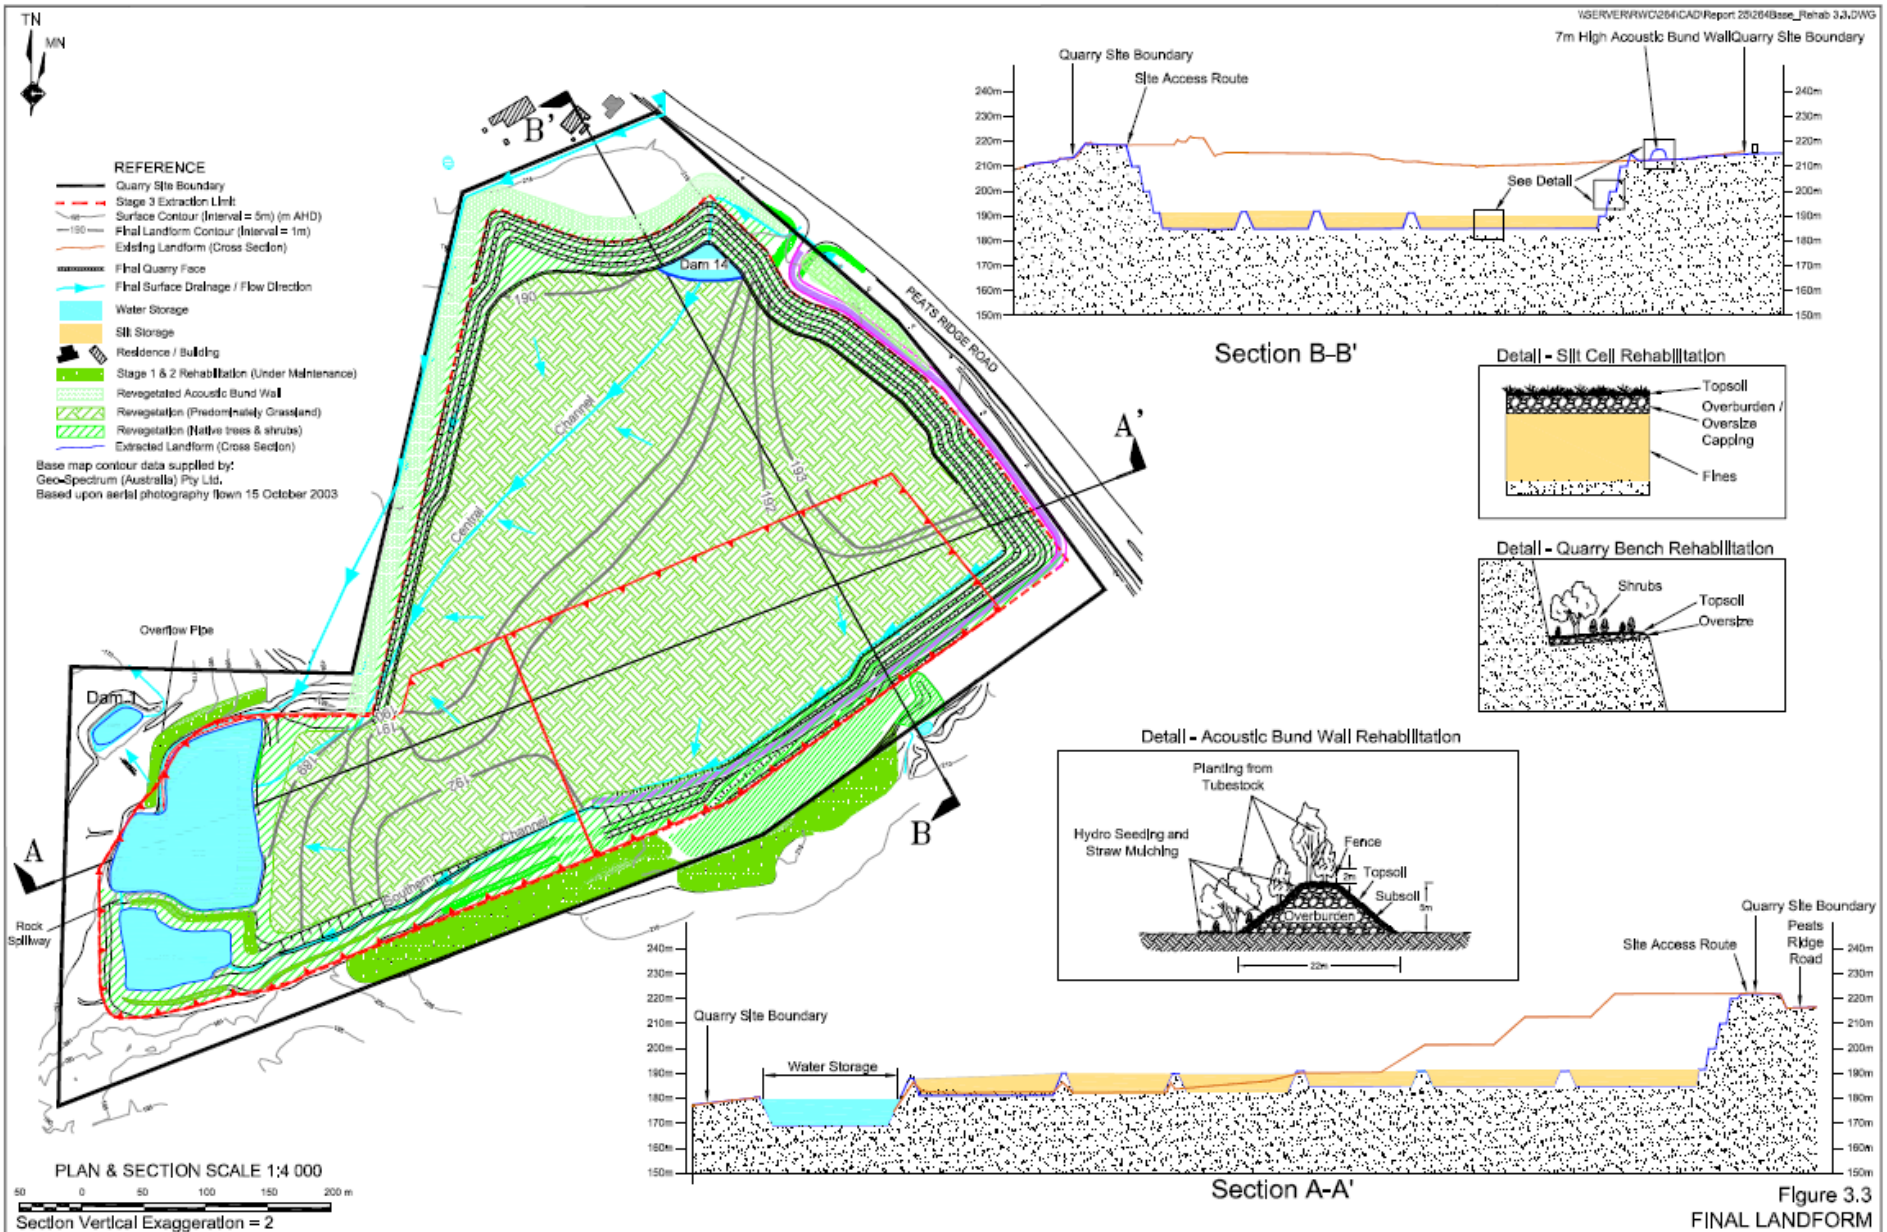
Final landform plan. Source: Rehabilitation and Landscape plan 2006 (RW Corkery).
